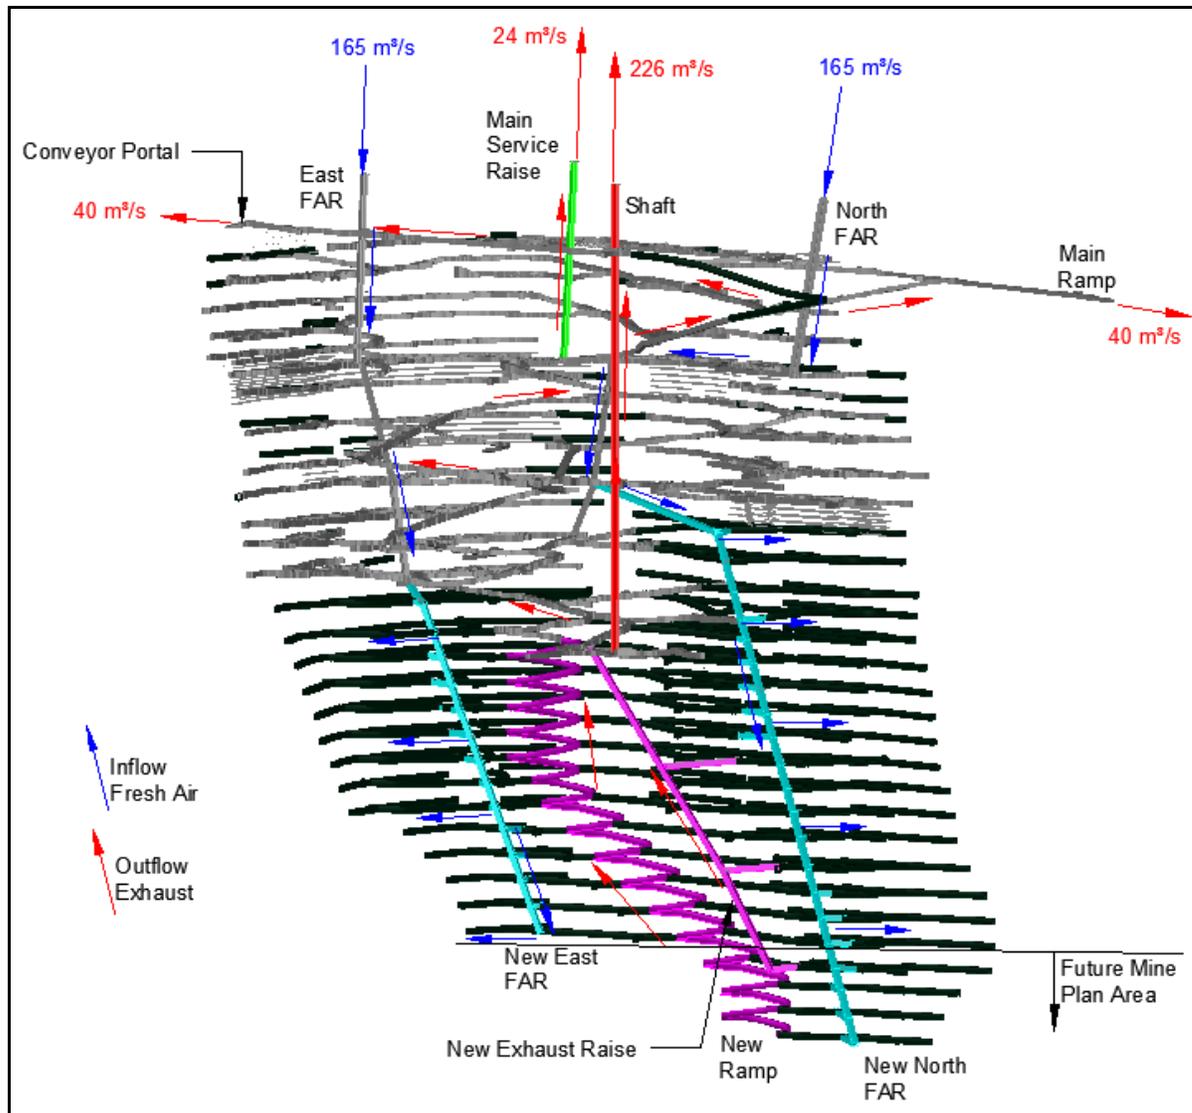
Caribou Underground Ventilation Schematic (Oblique View) (Trevali 2014)
